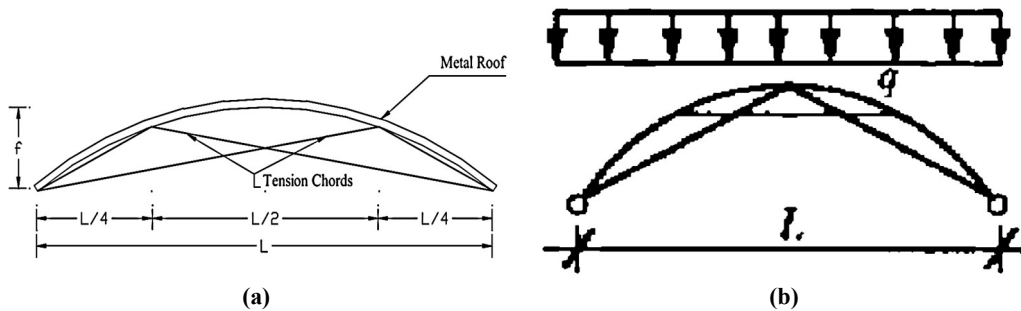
Tension cable layouts used to control deflection [6] [29]
